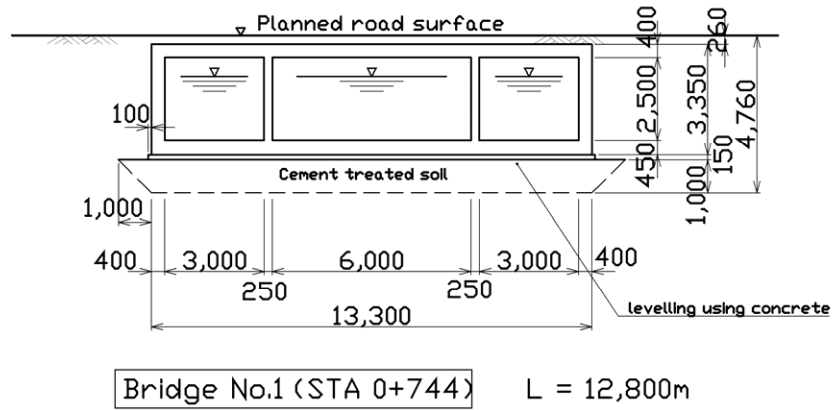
Box culvert cross section (Bridge No.1)
